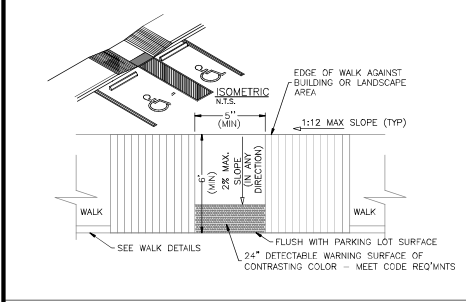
DETAIL BRUSHED CONCRETE SIDEWALK SCALE: N.T.S. ②
